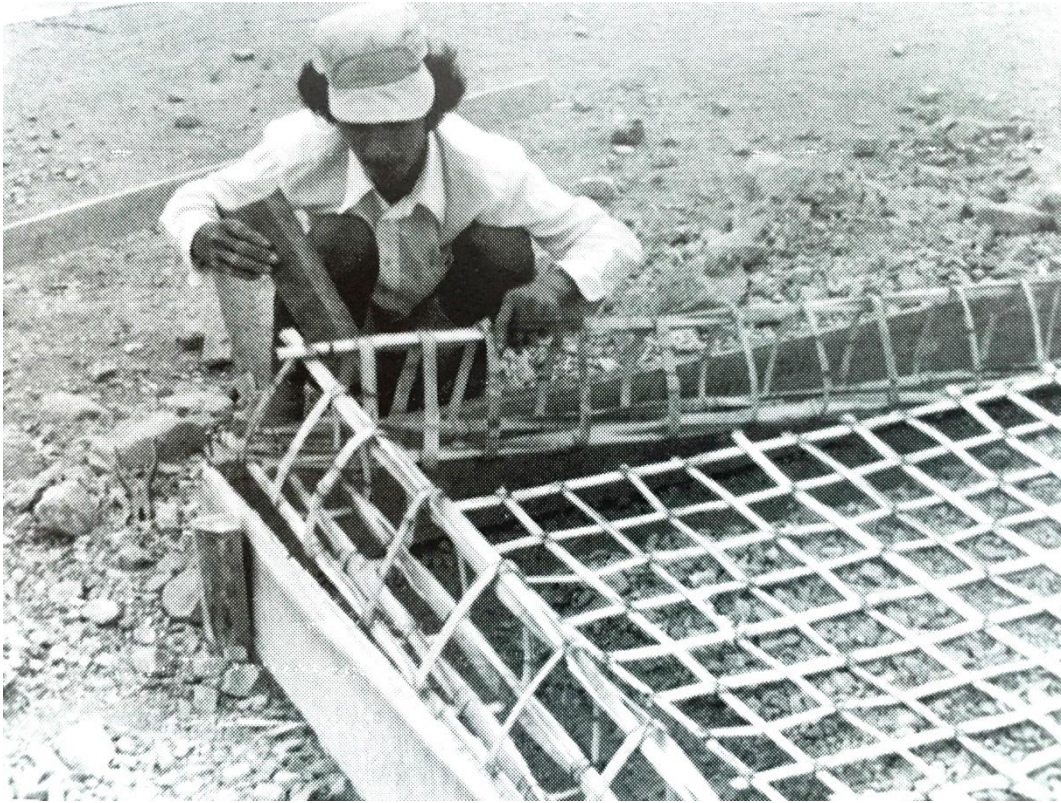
Bamboo cables employed to reinforce concrete floor in Ecuador (Hidalgo-Lopez 2003)
